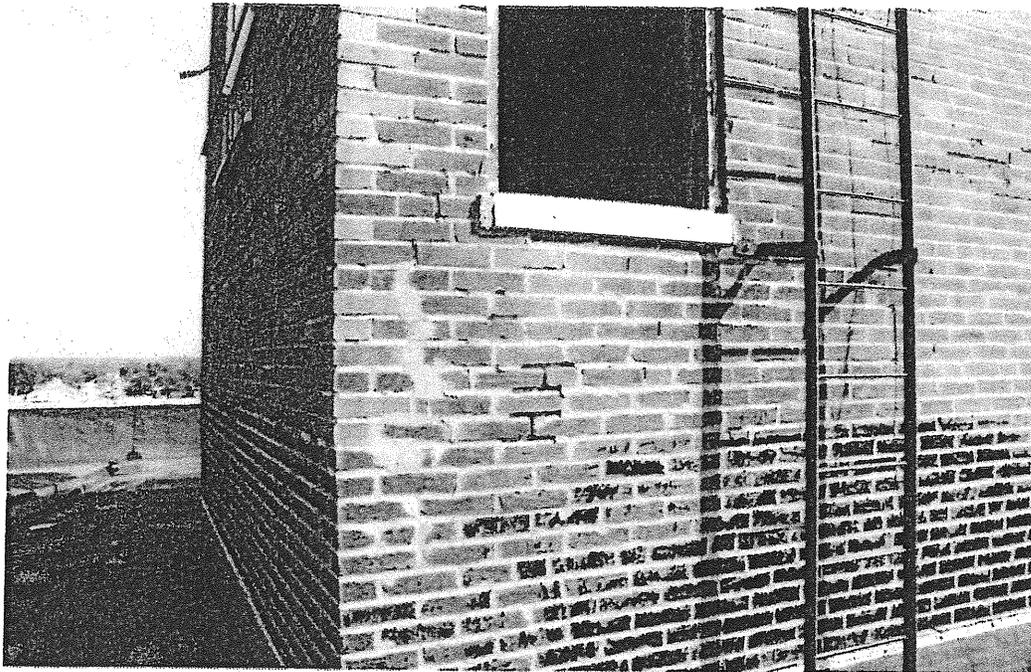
Southwest corner of penthouse. Note past tuckpointing, mortar erosion and deterioration.
